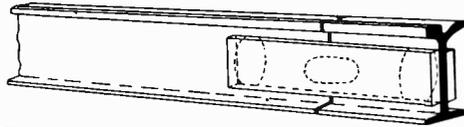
Illustrating Process of Welding a Rail Joint.
